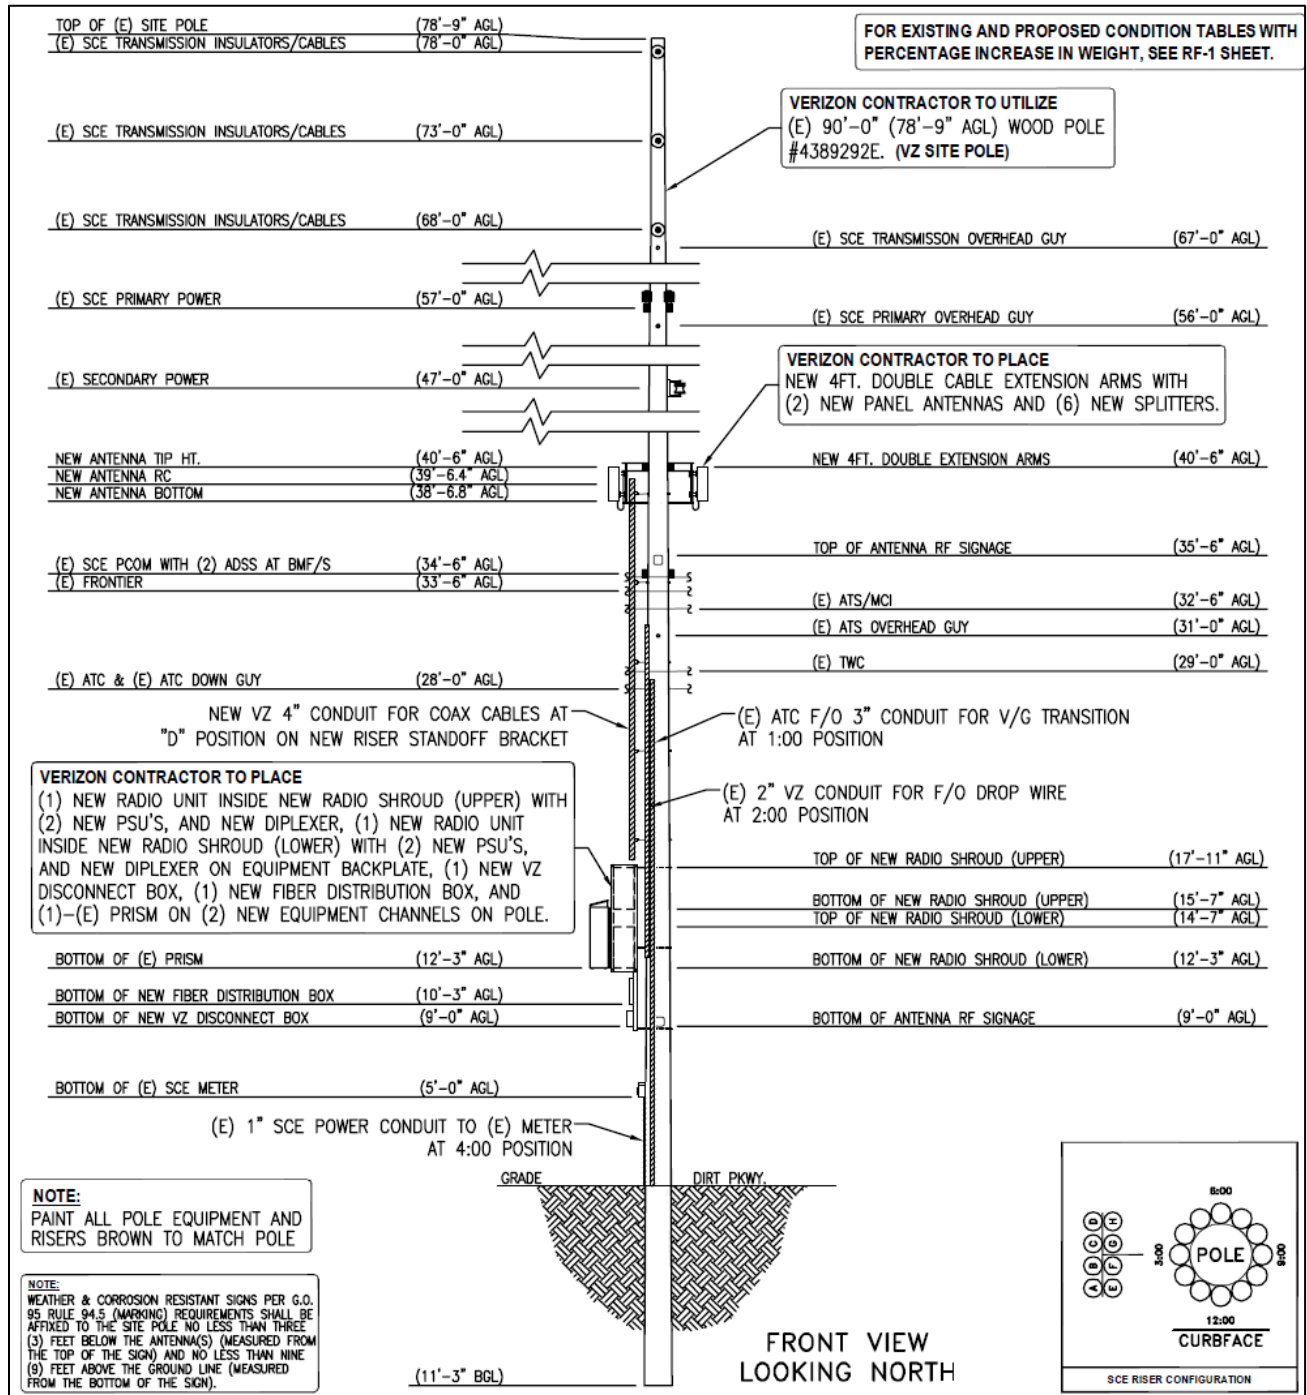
Elevation view of Verizon's proposed wireless site. (Source: Plans, page A-3, panel 4).
